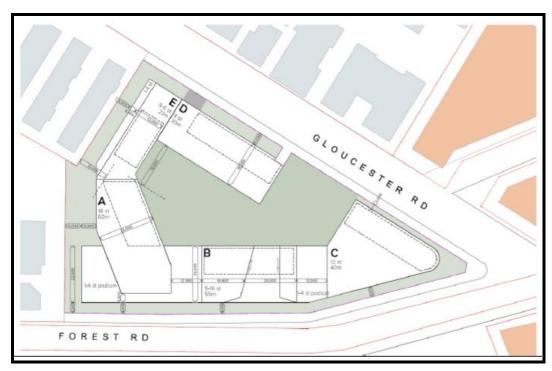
Concept Master Plan (Source: Fig 2 Section 8.3 HDCP 2)
